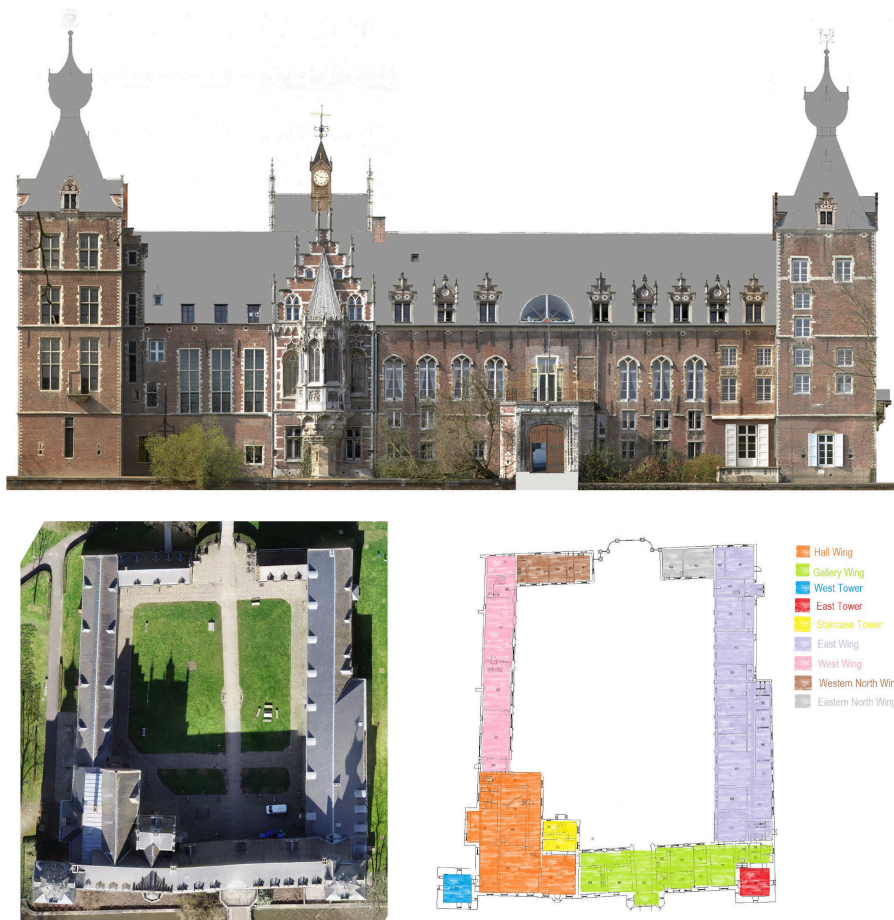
South facade of Arenberg Castle, above [image: KU Leuven / Koufopoulos et al. 2021]; aerial view of the main building, left [image: KU Leuven / Koufopoulos et al. 2021]; floor plan of the ground floor with color labeling of different structural units, right. [Image: atlas plan, KU Leuven, [Technical Services](#)]
